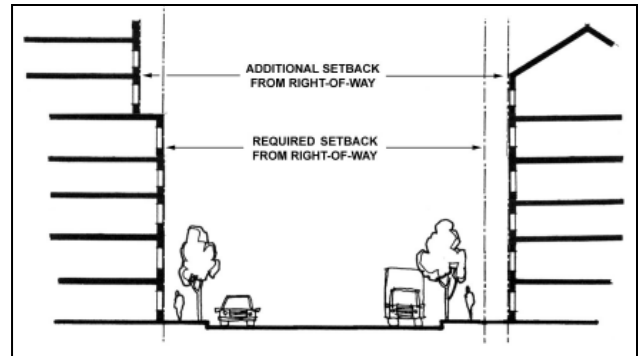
To reduce the impact of tall buildings along pedestrian-oriented streets in the CE and TOD districts, either the portion of the building that is higher than 60 feet or the building itself must be set back from the street right-of-way.
